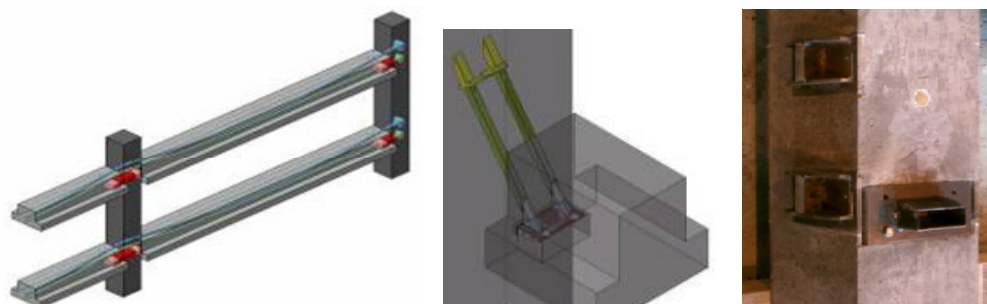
a) Brooklyn system: suspended solution. b) cable-stayed version of the hidden steel bracket (Pampanin 2005, Pampanin et al. 2004). c) Details of arrangement for external dissipators and simplified shear key/corbel.
